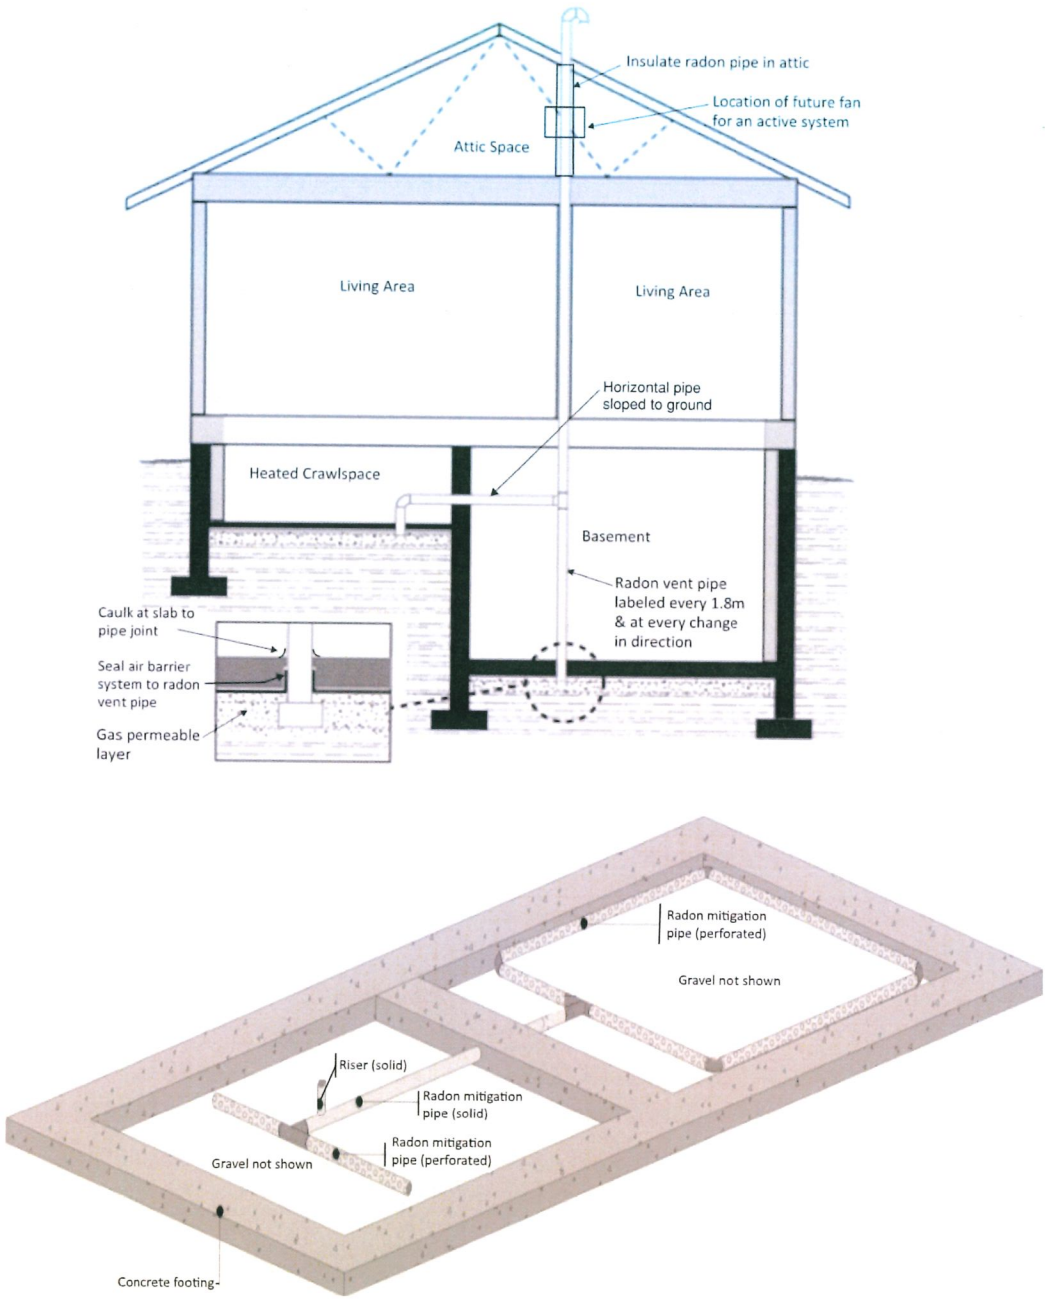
Possible interconnection of two gas permeable layers
